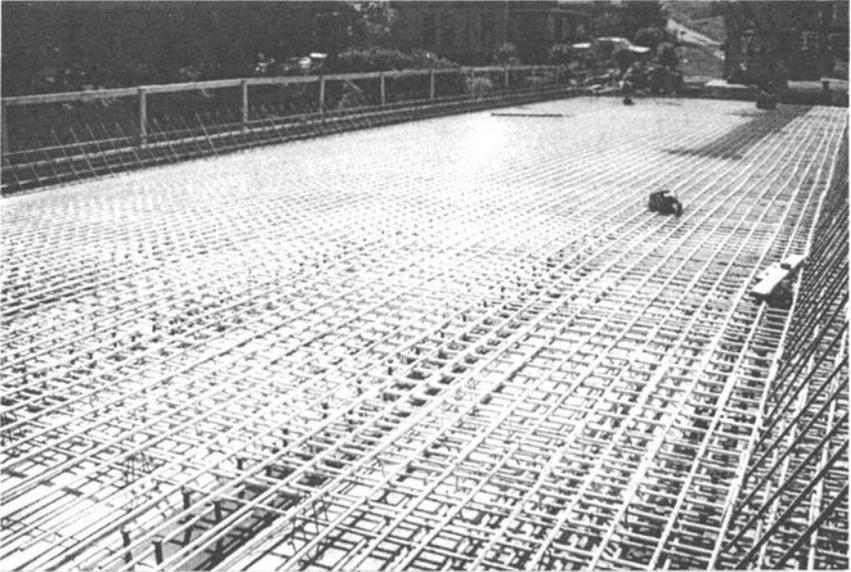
FRP Rebars in Concrete Bridge Deck - McKinleyville Bridge
